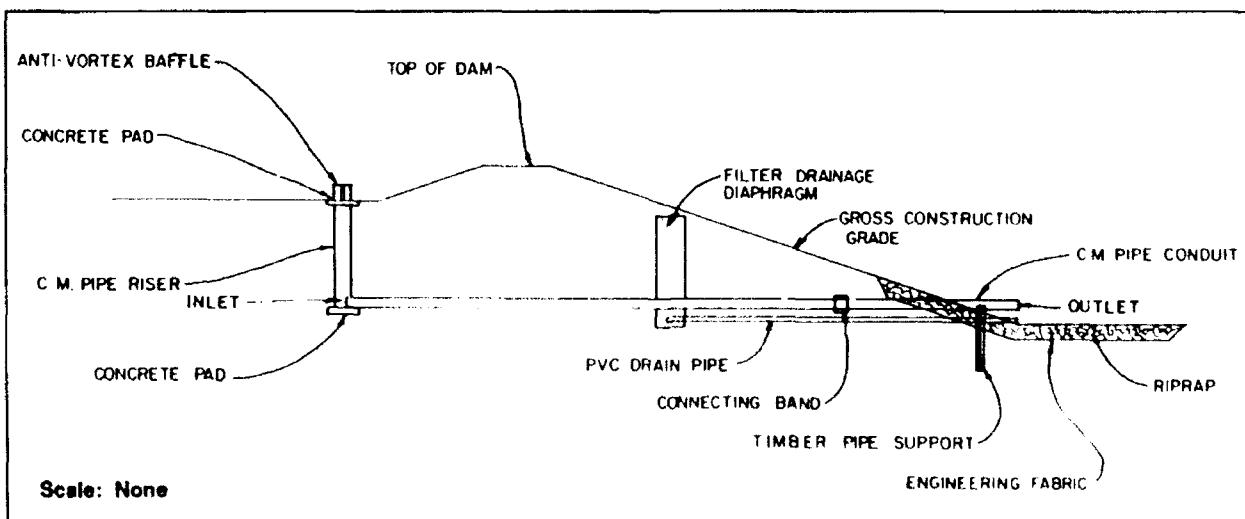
Profile along center line of pipe, riser-pipe grade control structure
